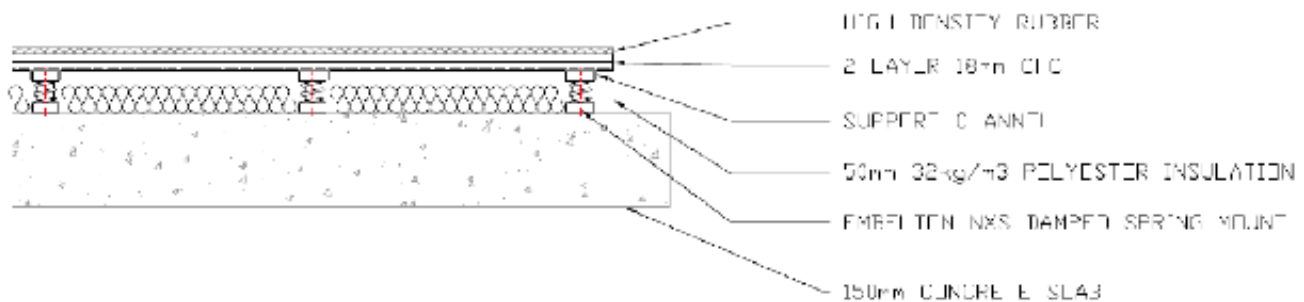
Damped springs with 2-layer 18mm CFC with top surface rubber build-up
